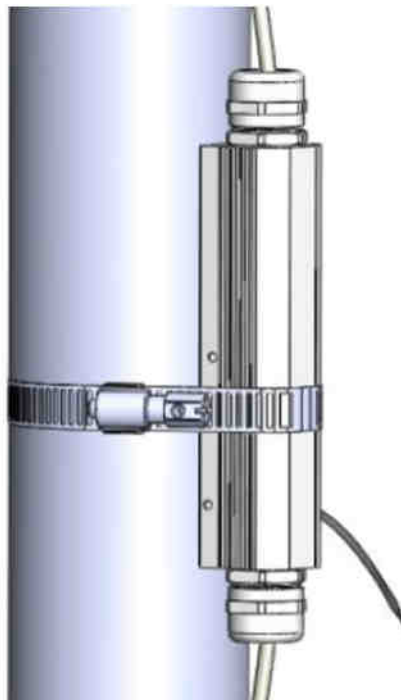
Outdoor Ethernet Surge protection – pole mounting with strapping
